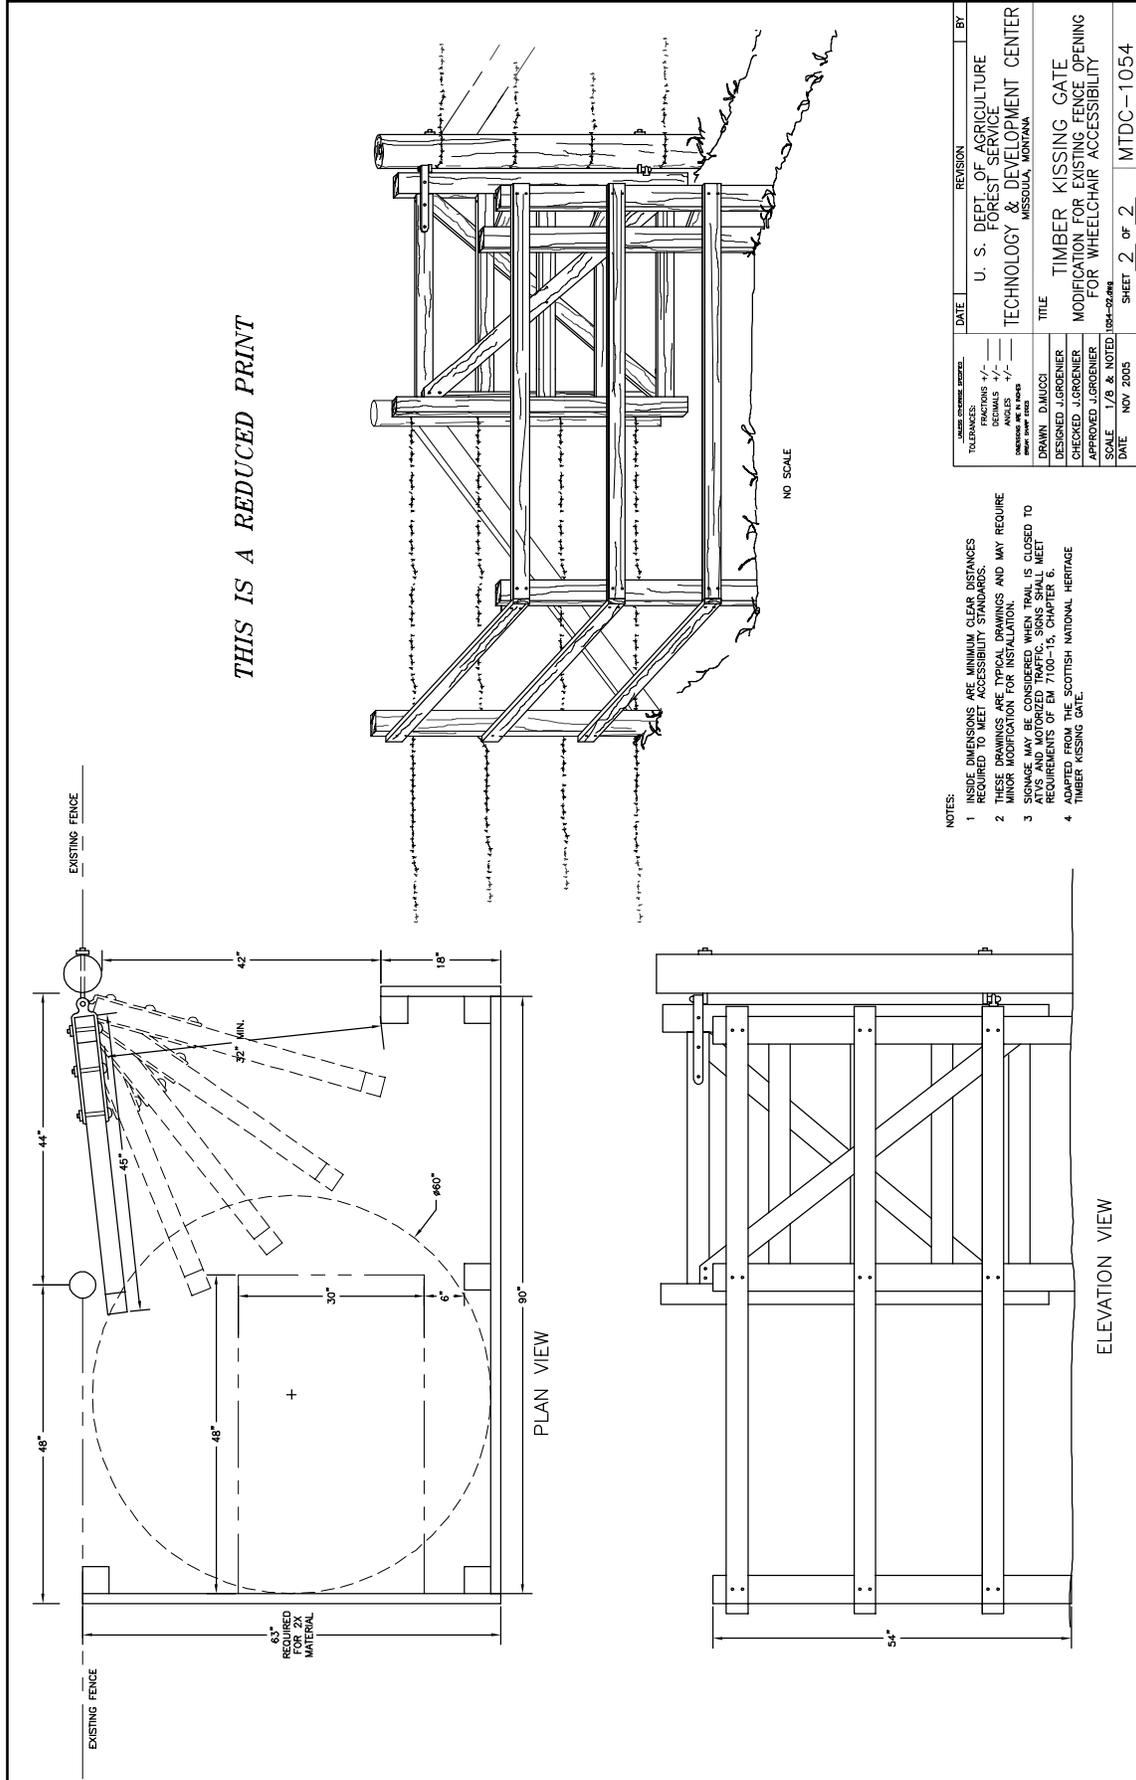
Accessible modified timber kissing gate drawing (MTDC-1054-02) for installation into existing gate openings.
